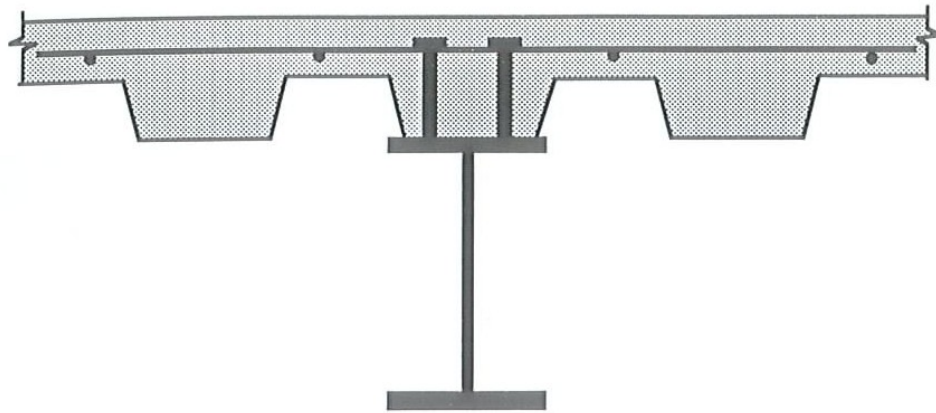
Composite beam with ribbed metal deck (oriented parallel to the beam).
